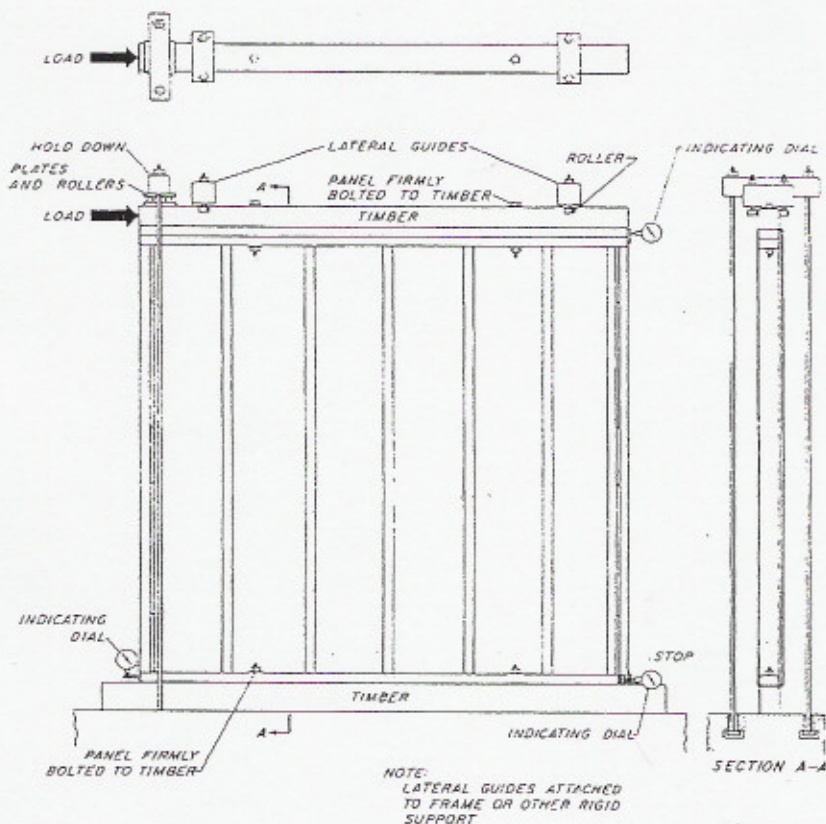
Test Setup for Racking (in-Plane) Loading
